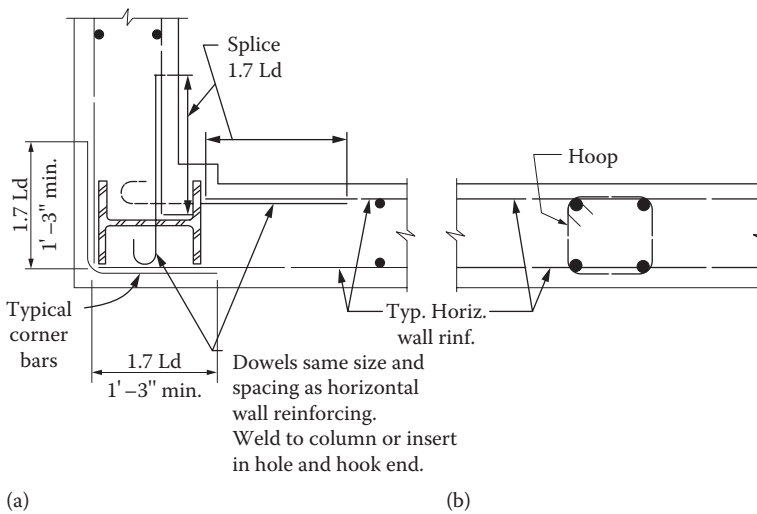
(a) Steel member in concrete wall. (b) Wall-column.
